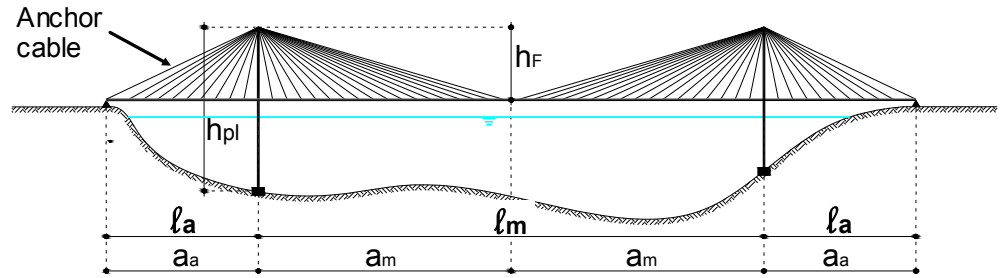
Symmetrical three-span Fan Cable-Stayed Bridge.
